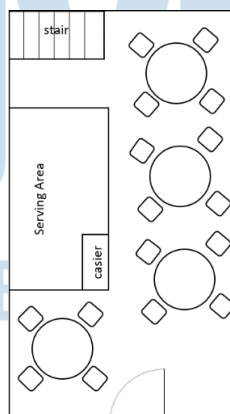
HYPNO TEA 1<sup>st</sup> Floor Plan
